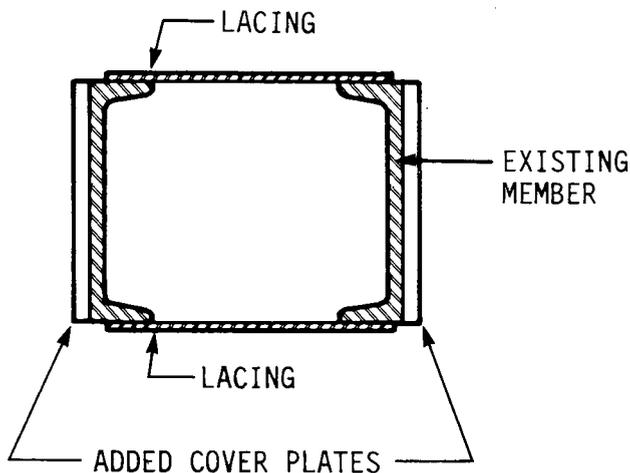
Design example—Member to be strengthened by addition of steel cover plates.
